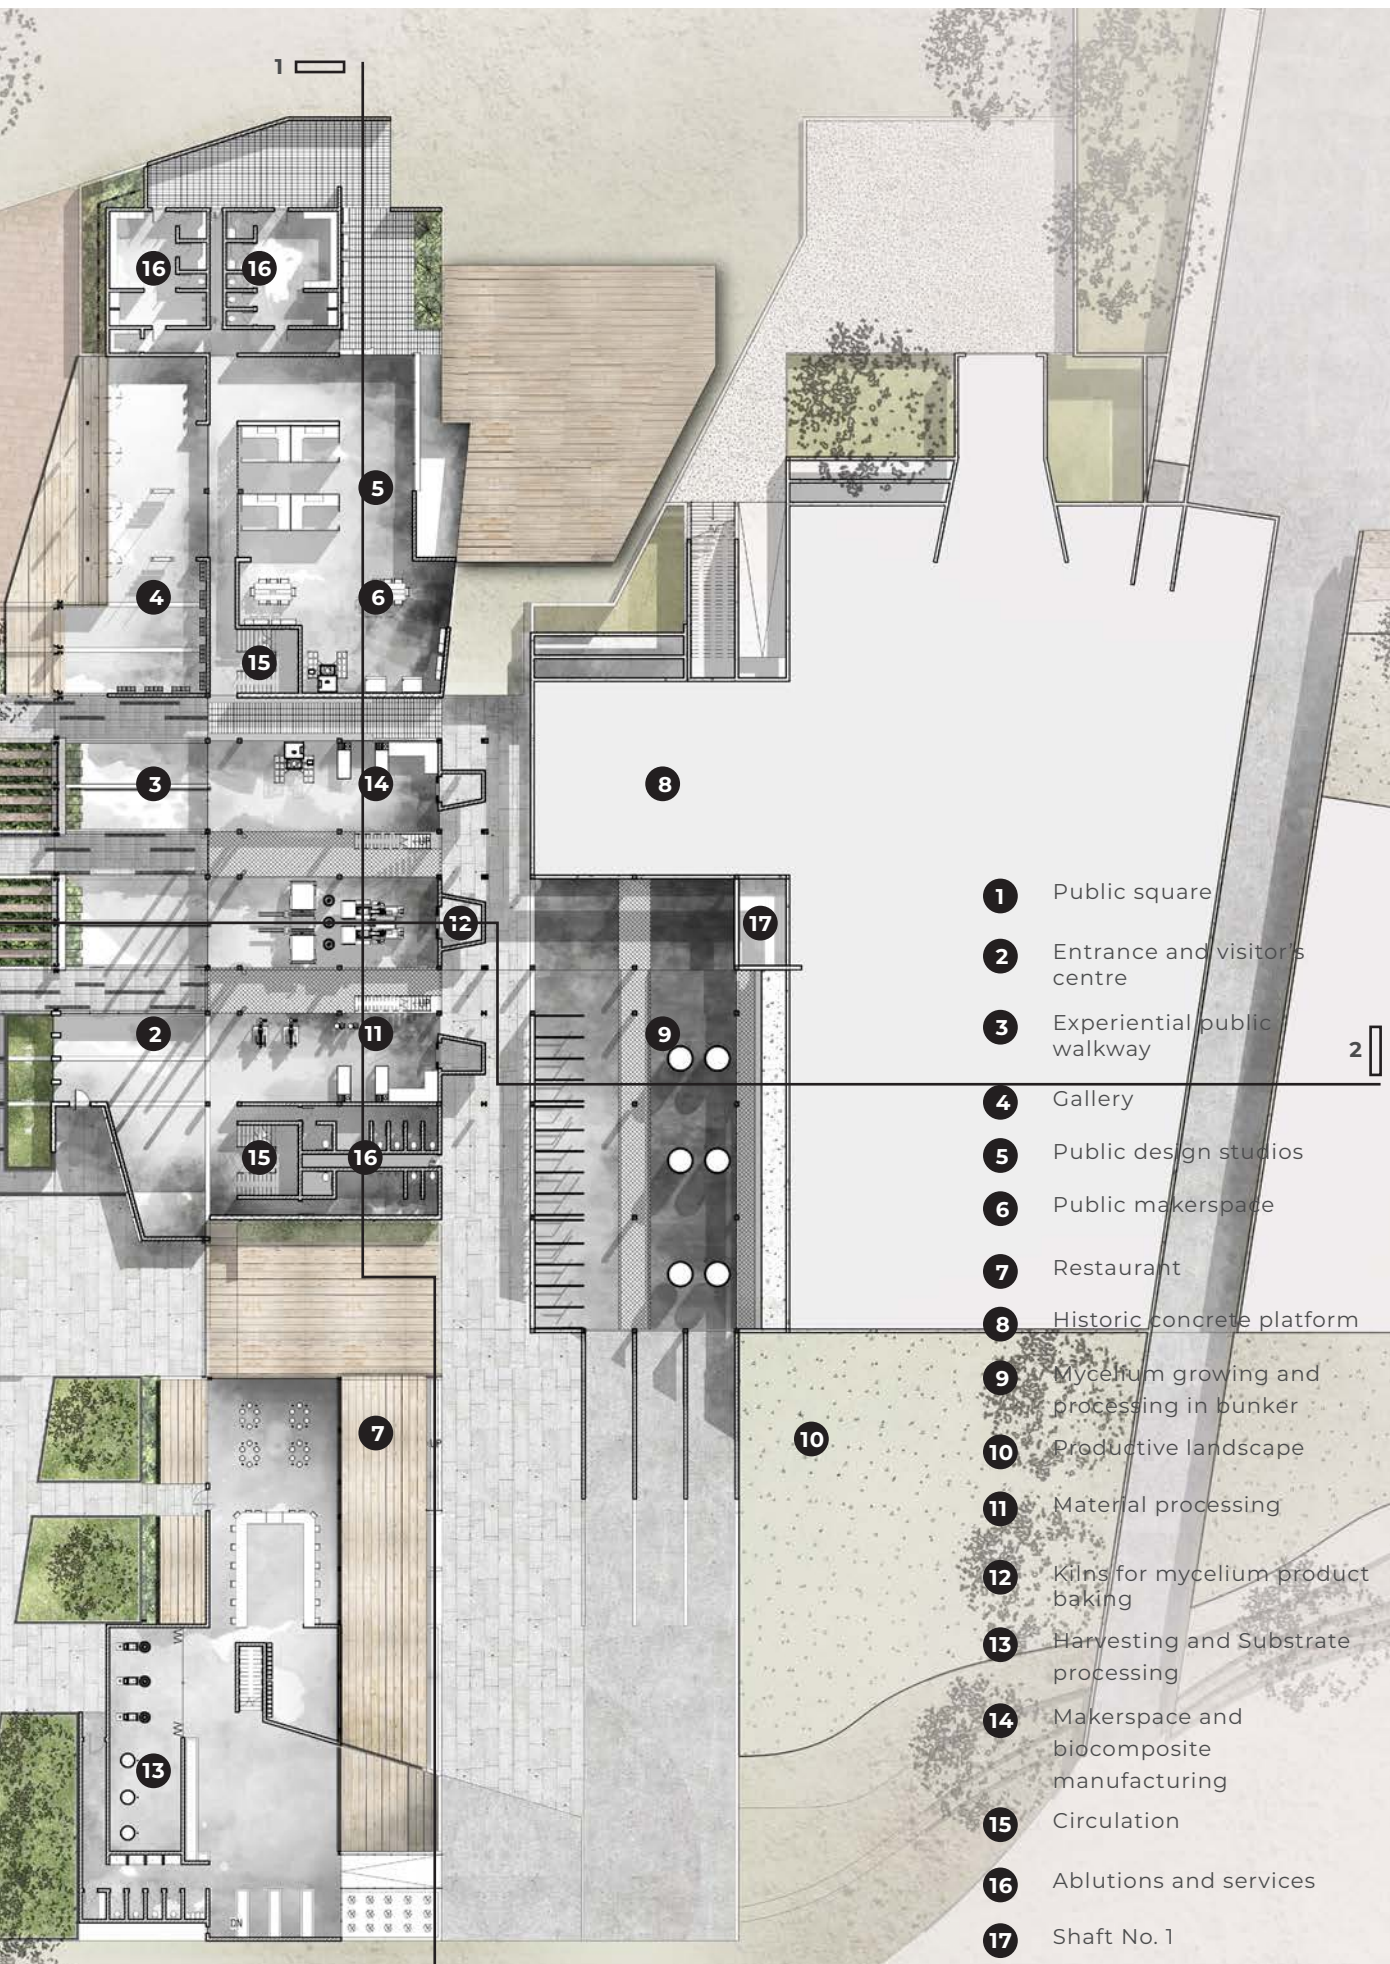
Site plan (Scale 1:500, original drawing 1:200)(Author:2018)
